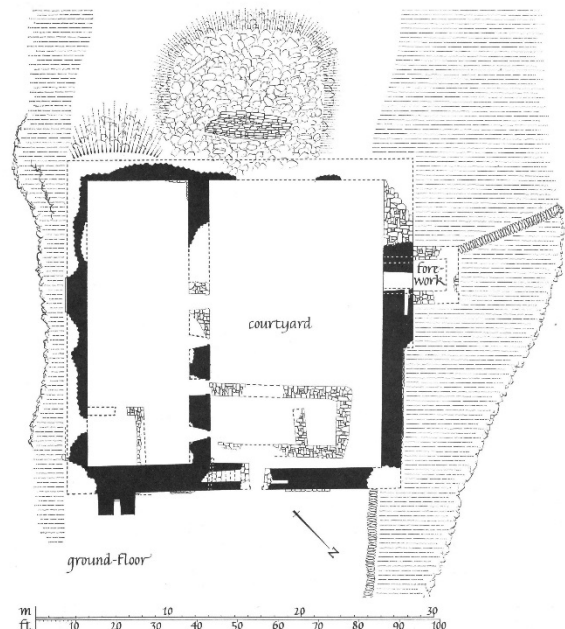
Achadun Castle, Lismore (No. 276); ground-floor plan
